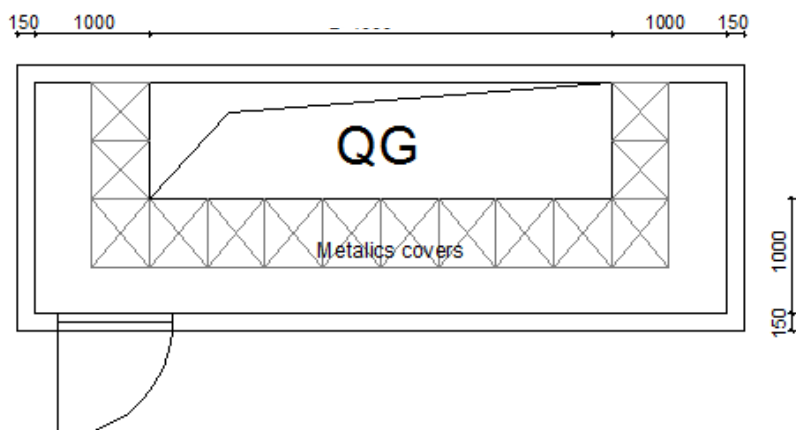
Minimum dimensions for main low voltage switchboard installation for collective installations with front connection.
